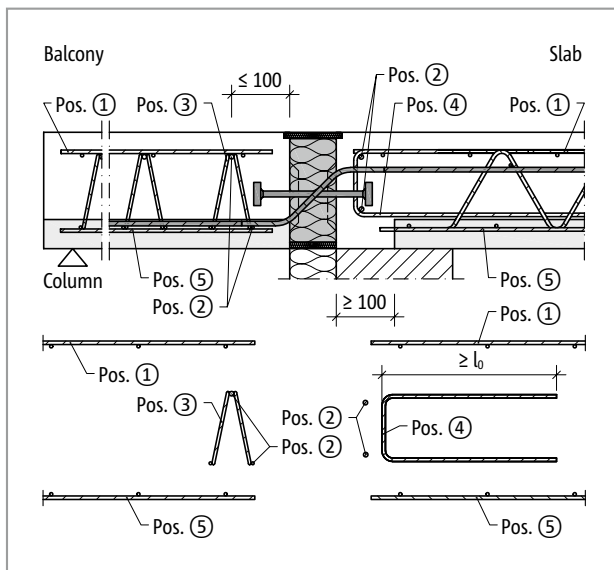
Schöck Isokorb® T type Q-P: On-site reinforcement with lattice beam
